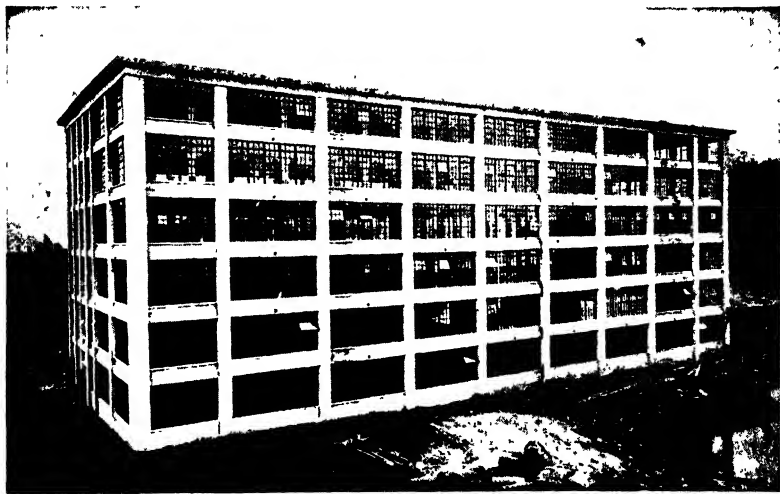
Simplest Form of Factory Building: Concrete Piers, Concrete Spandrels, and Curtain Walls. (See p. 729.)
